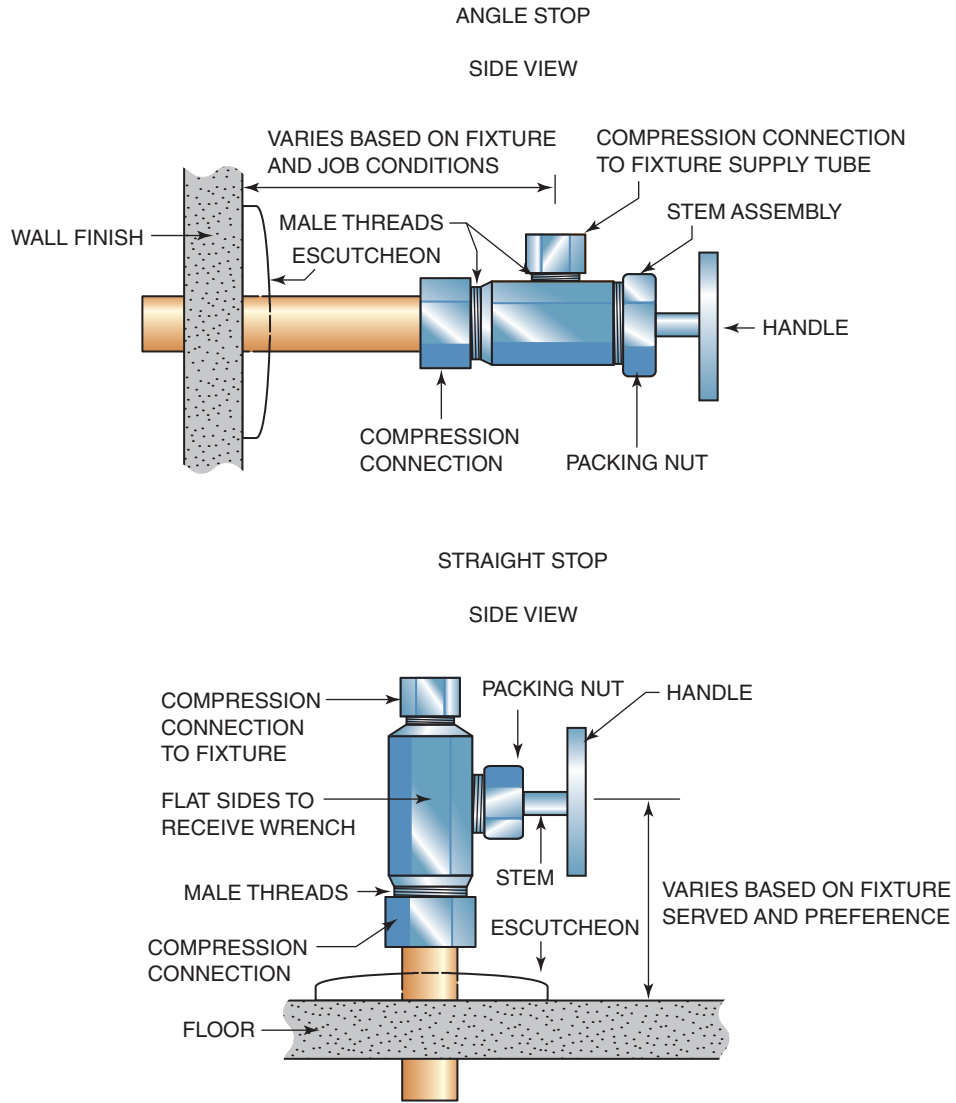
An angle stop and a straight stop are installed based on stub-out location.
